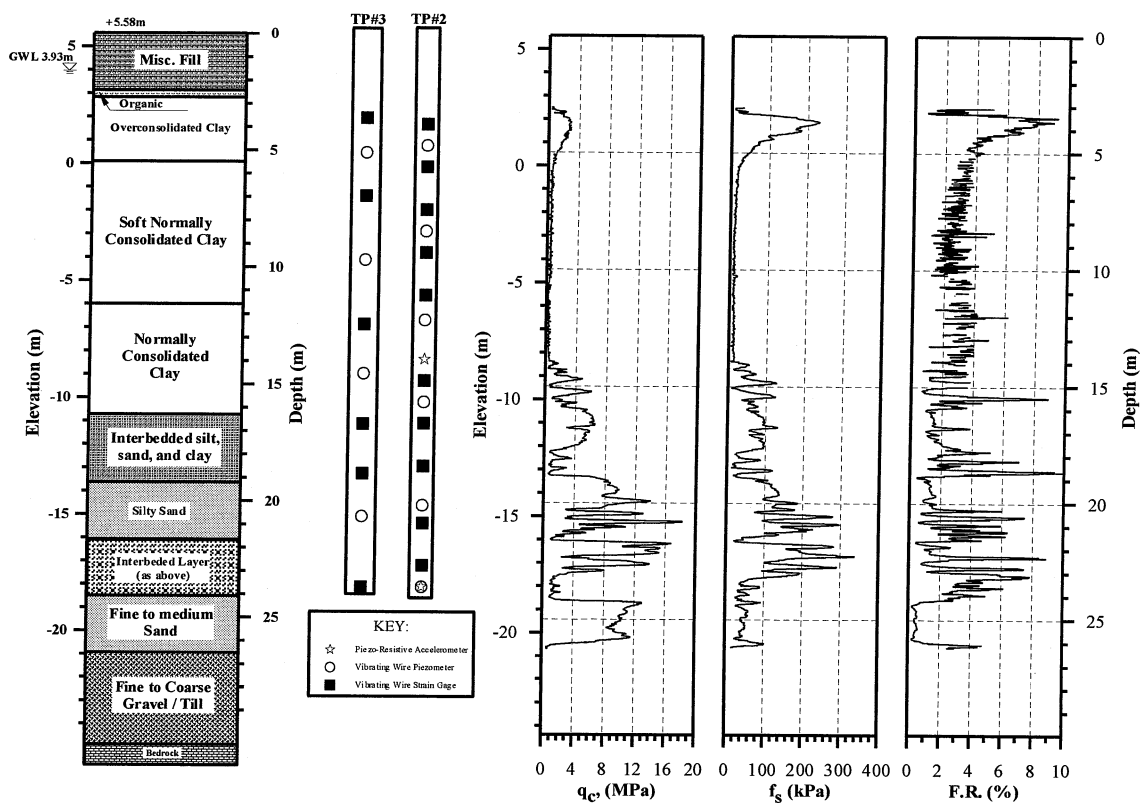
Newbury site soil profile with test piles #2 and #3 layouts and typical CPT test results.
